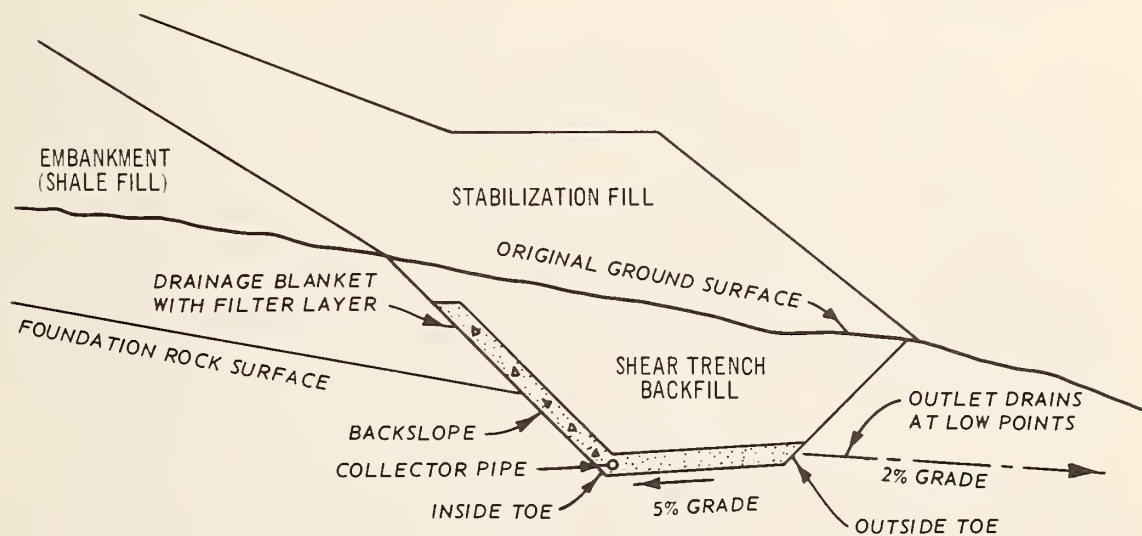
Recommended design of shear trenches for collecting groundwater seepage
